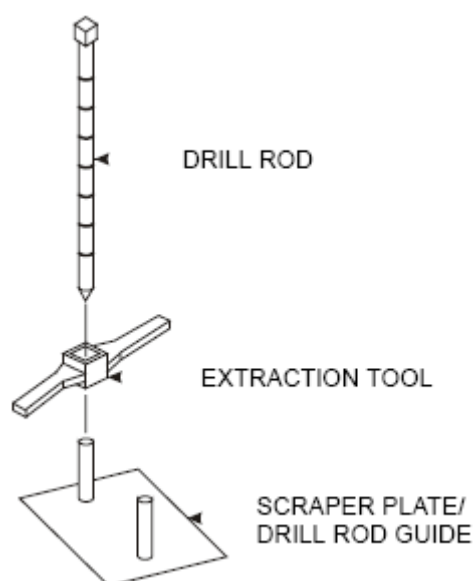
Drill rod and extraction tool with scraper plate (Source: Troxler 3440 Manual)
